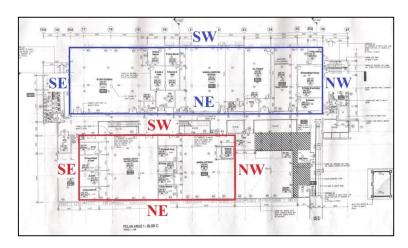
FPTV (Block C) - Floor Plan Drawing (First Floor)
